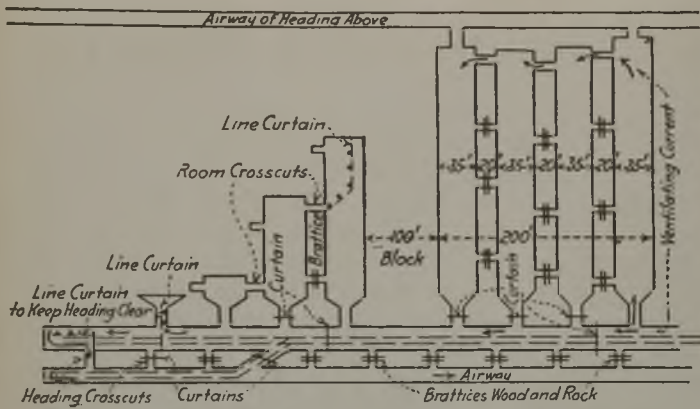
Plan of Entry and Rooms in Pitching Bed
